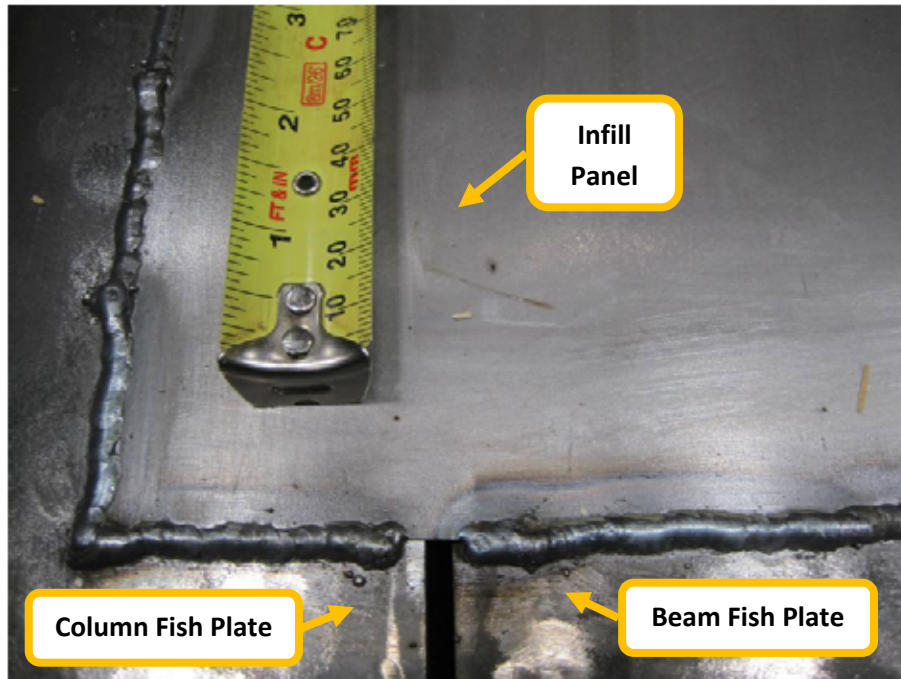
Finished Corner Detail Following the Second Circuit of Stitch Welding
